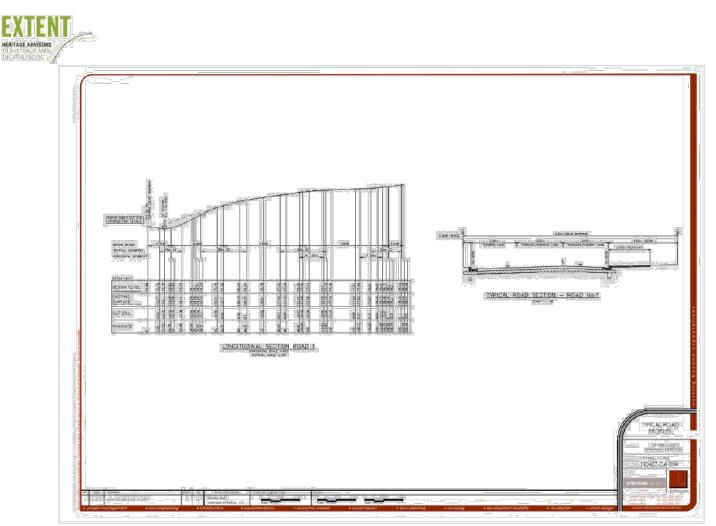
profile section of the proposed mid block entrance road (source: ADW Johnson, Typical Road Profiles, Drawing No.190427-DA-004).
